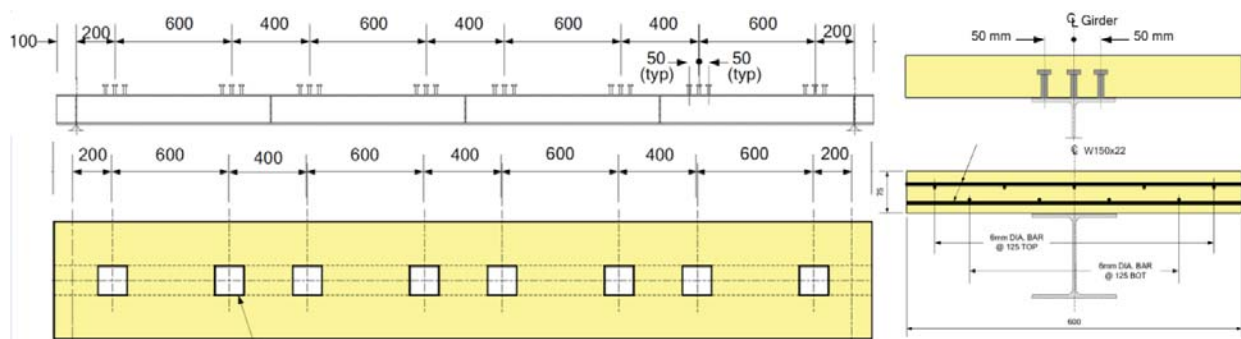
Precast-steel composite beam specimen geometry (Huh et al., 2010).
